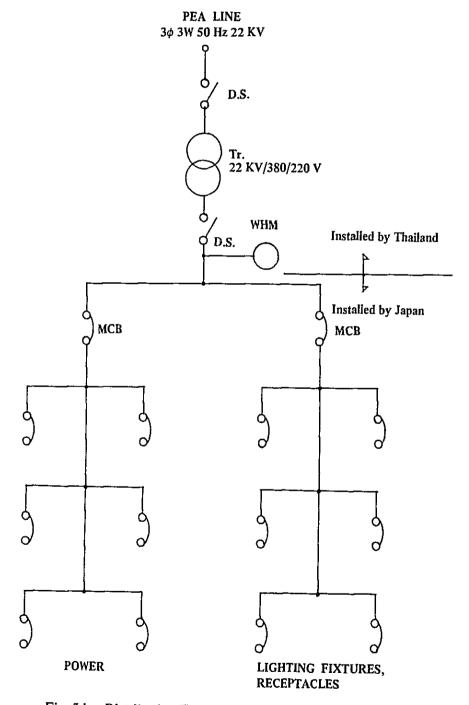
i Distribution Facility, Single Line Wiring Diagram
